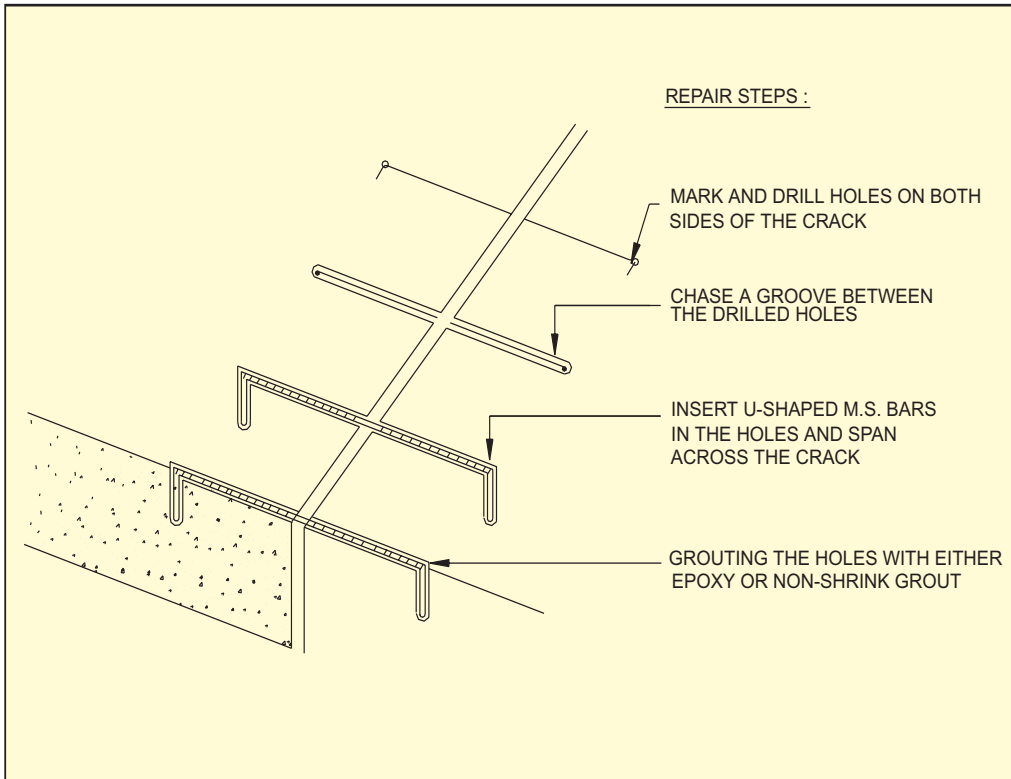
(a) Stitching Method of Repairing Wall/Slab Cracks
